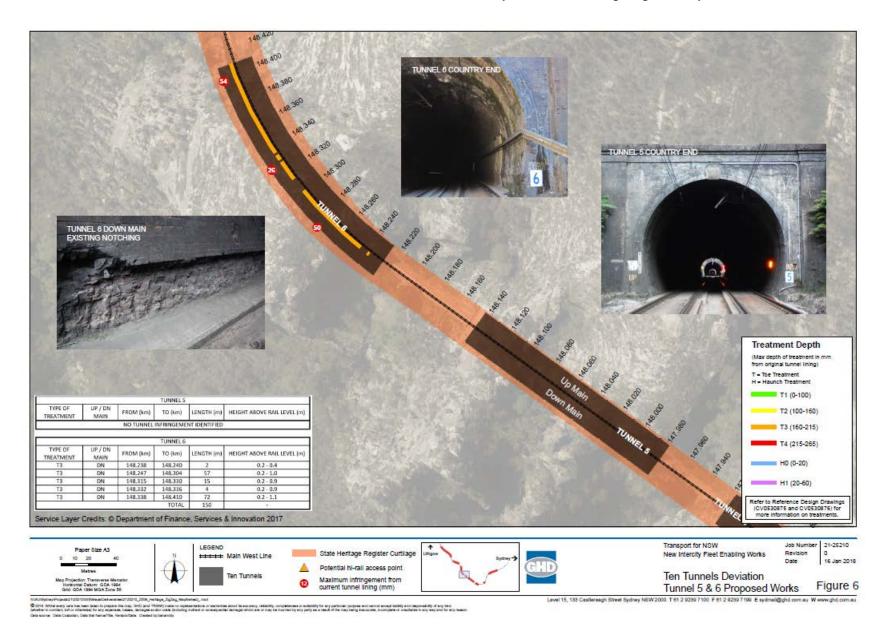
Proposed treatment overview for Tunnel 5 and Tunnel 6 (GHD Great Zig Zag Railway deviation tunnels Heritage Design Summary 2018)
